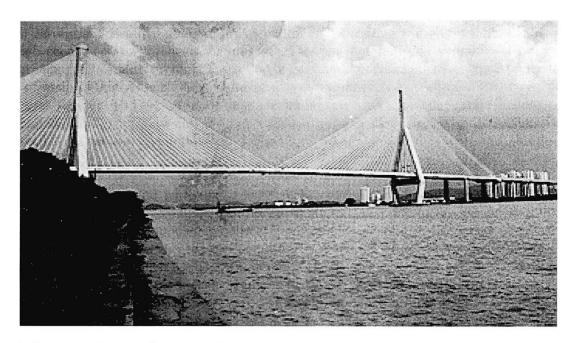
The general view of Panyu cable-stayed bridge after its completion
